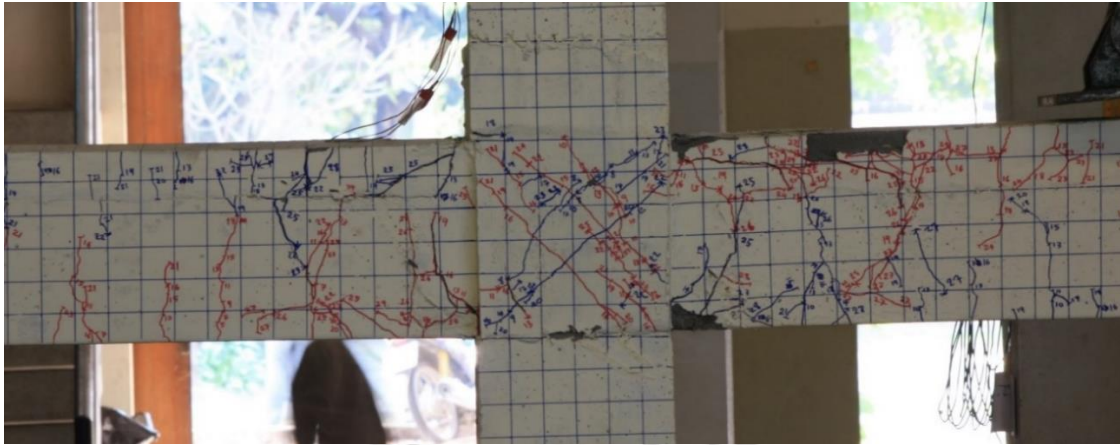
Crack distribution of precast specimen P3 at the end of testing
